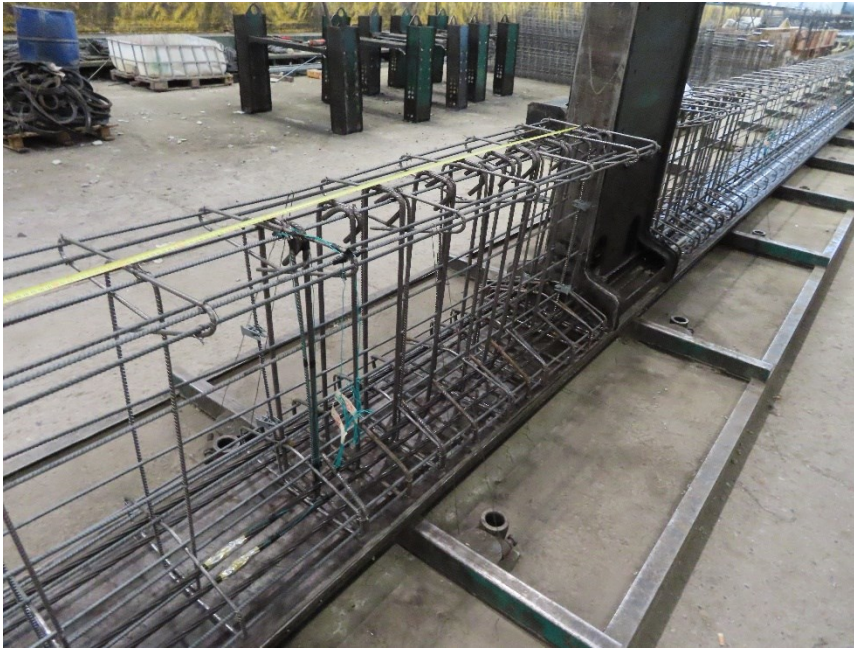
Reinforcement in the factory before casting – Beam A.
